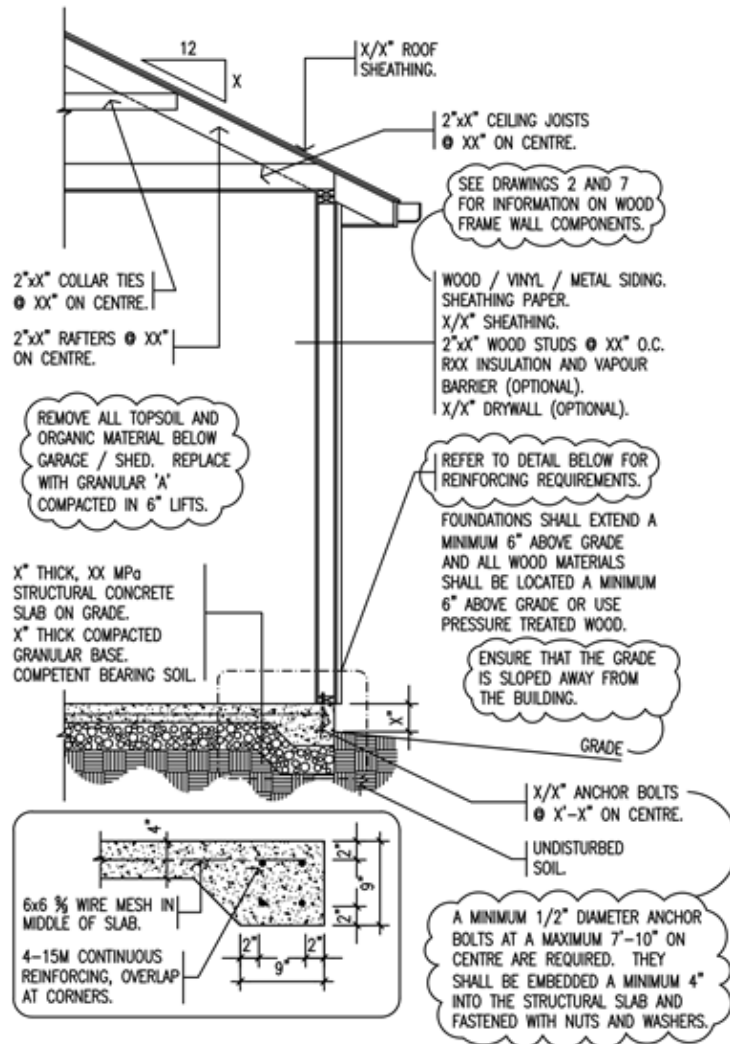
of 9: CROSS SECTION – Accessory Structure
